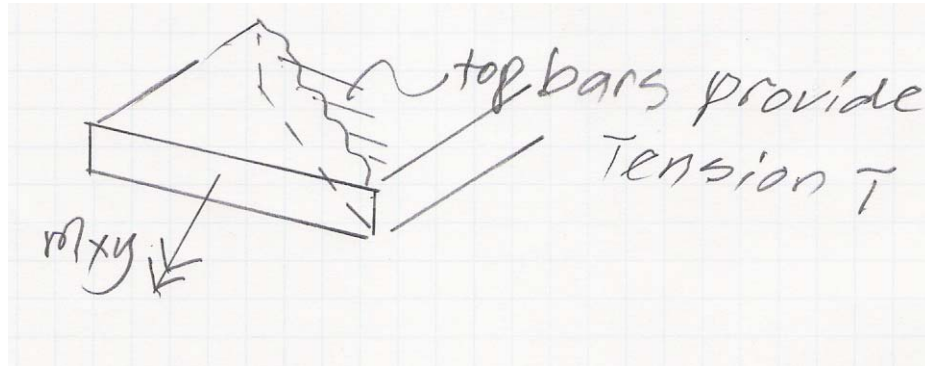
SHOWING LOCAION OF REINFORCEMENT TO RESIST TWISTING MOMENT
